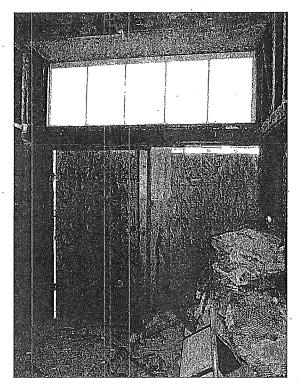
Interior view of storefront at second bay along Kearny Street. Note historic wood and glass transom above infilled plywood (photograph taken on 04/02/2018).
